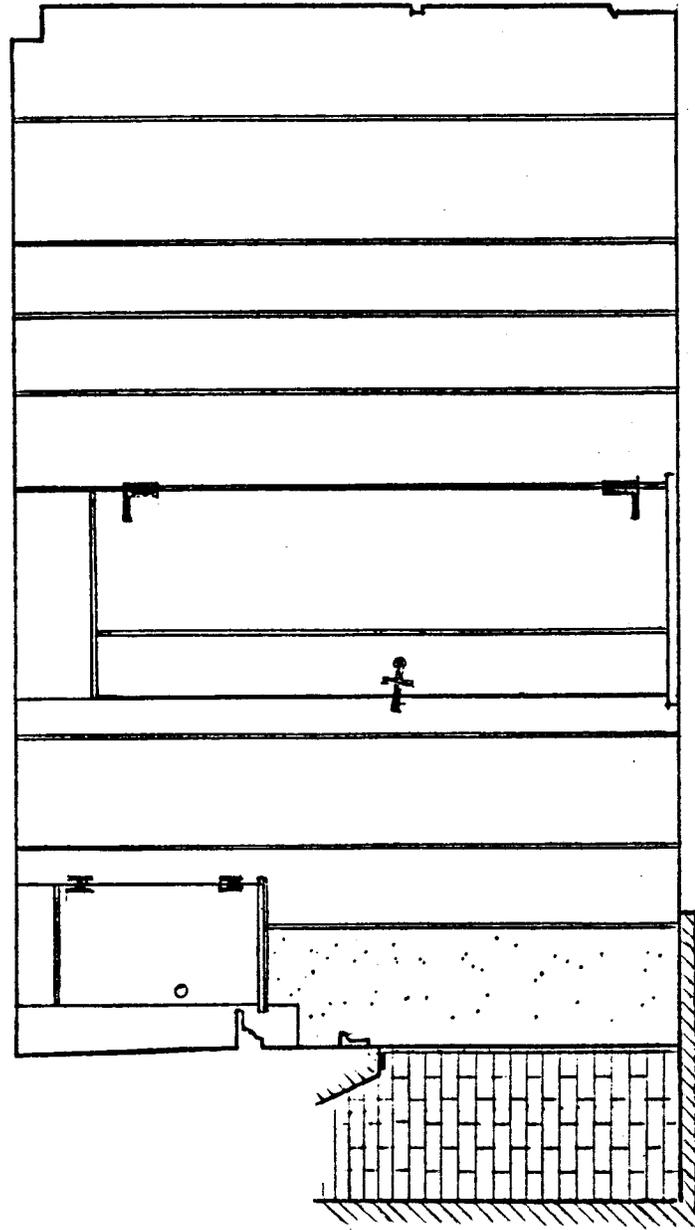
Atwood-Higgins House: East Kitchen, West Wall.
